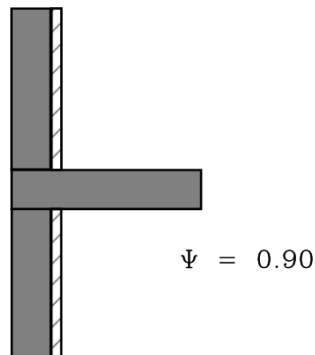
A reproduction of a simplified concrete wall assembly with interior insulation at through wall slab from ISO 14683:2007
